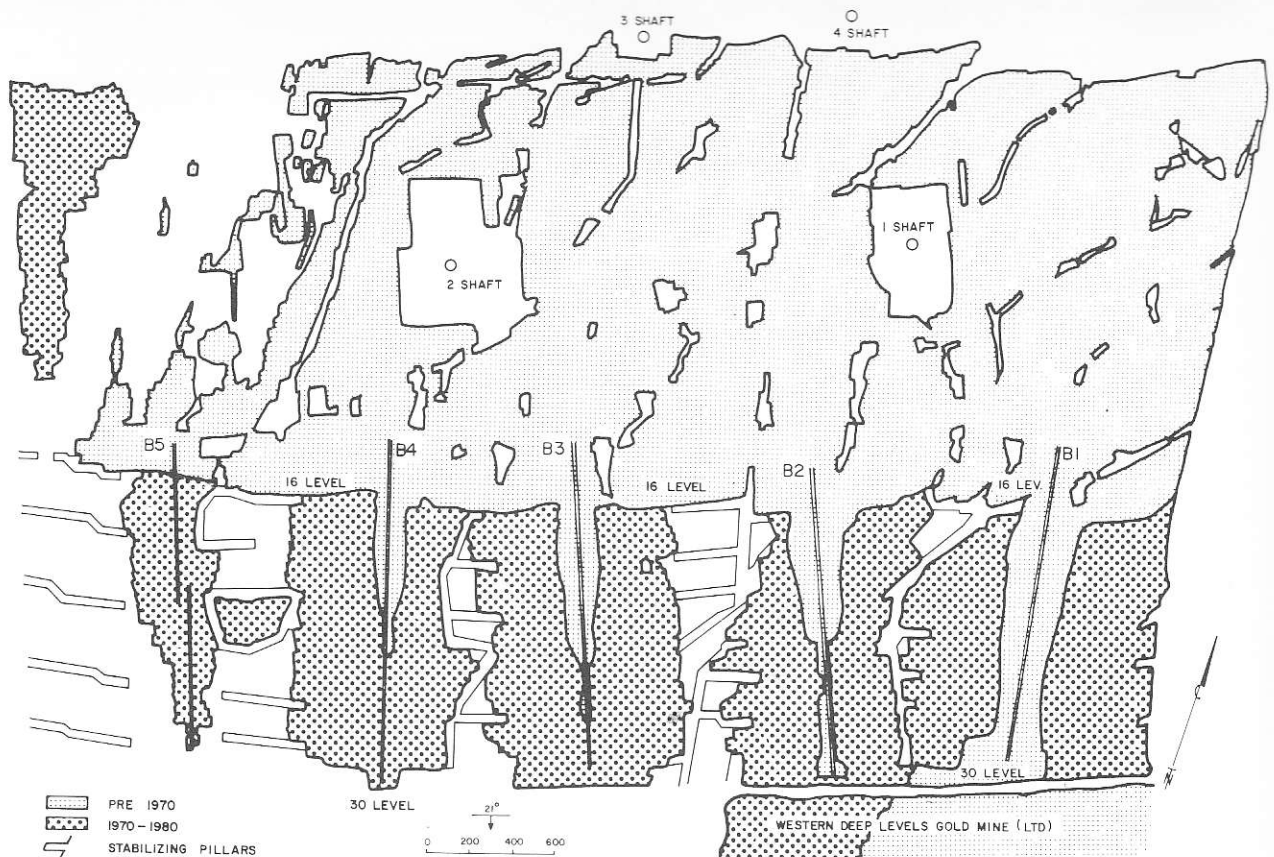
Plan of Blyvooruitzicht, showing remnants above 16 level, and longwalls and stabilizing pillars below 16 level
